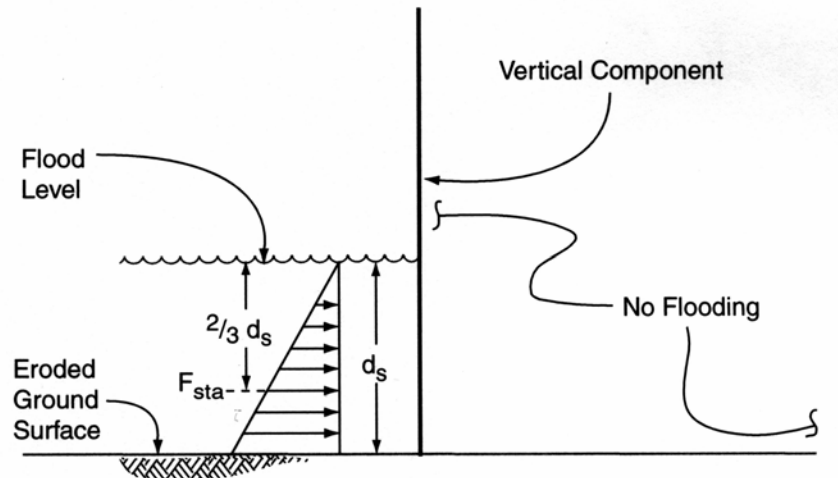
Pressure distribution due to standing water on the outside of a vertical wall. Reprinted with permission from the FEMA Coastal Construction Manual (FEMA, 2000).
